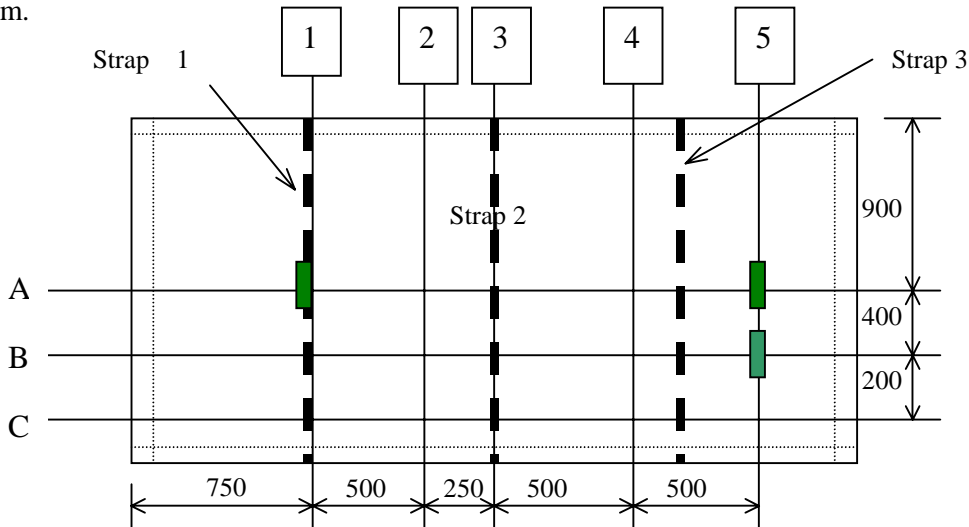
Plan view of a specimen and loading locations (B5 only for control specimen)
